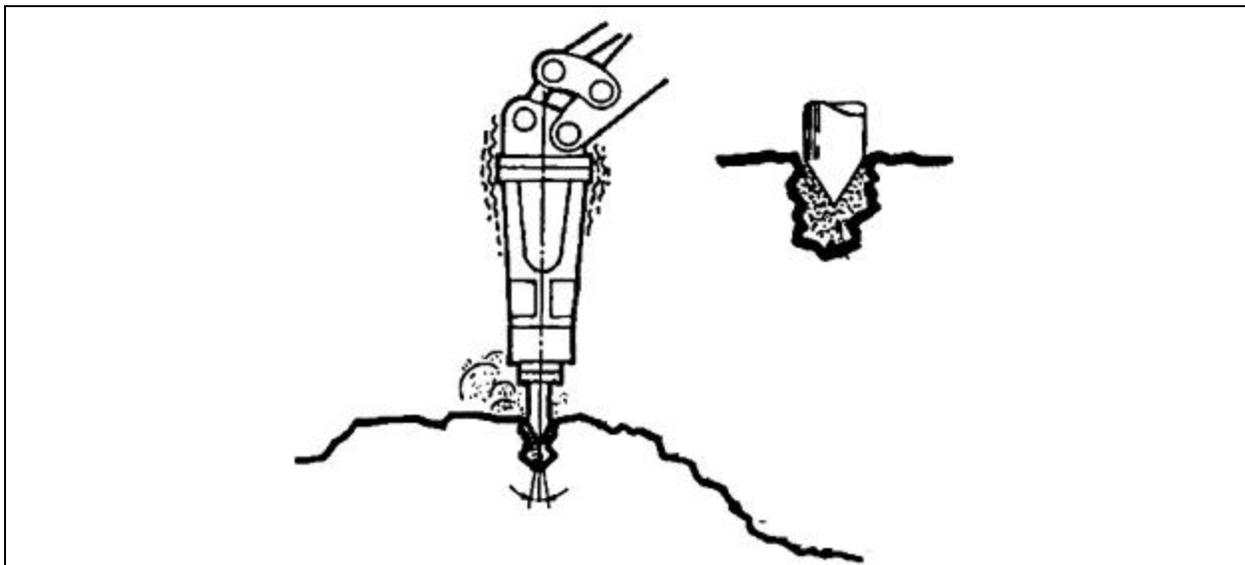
Dust Pockets May Cause Tools To Become Deformed
